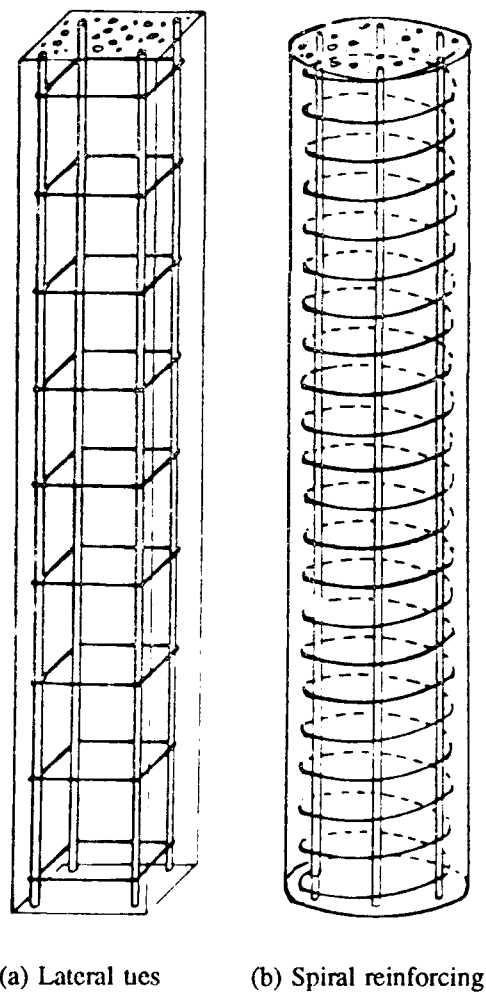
Lateral ties and spiral reinforcing in concrete columns.
